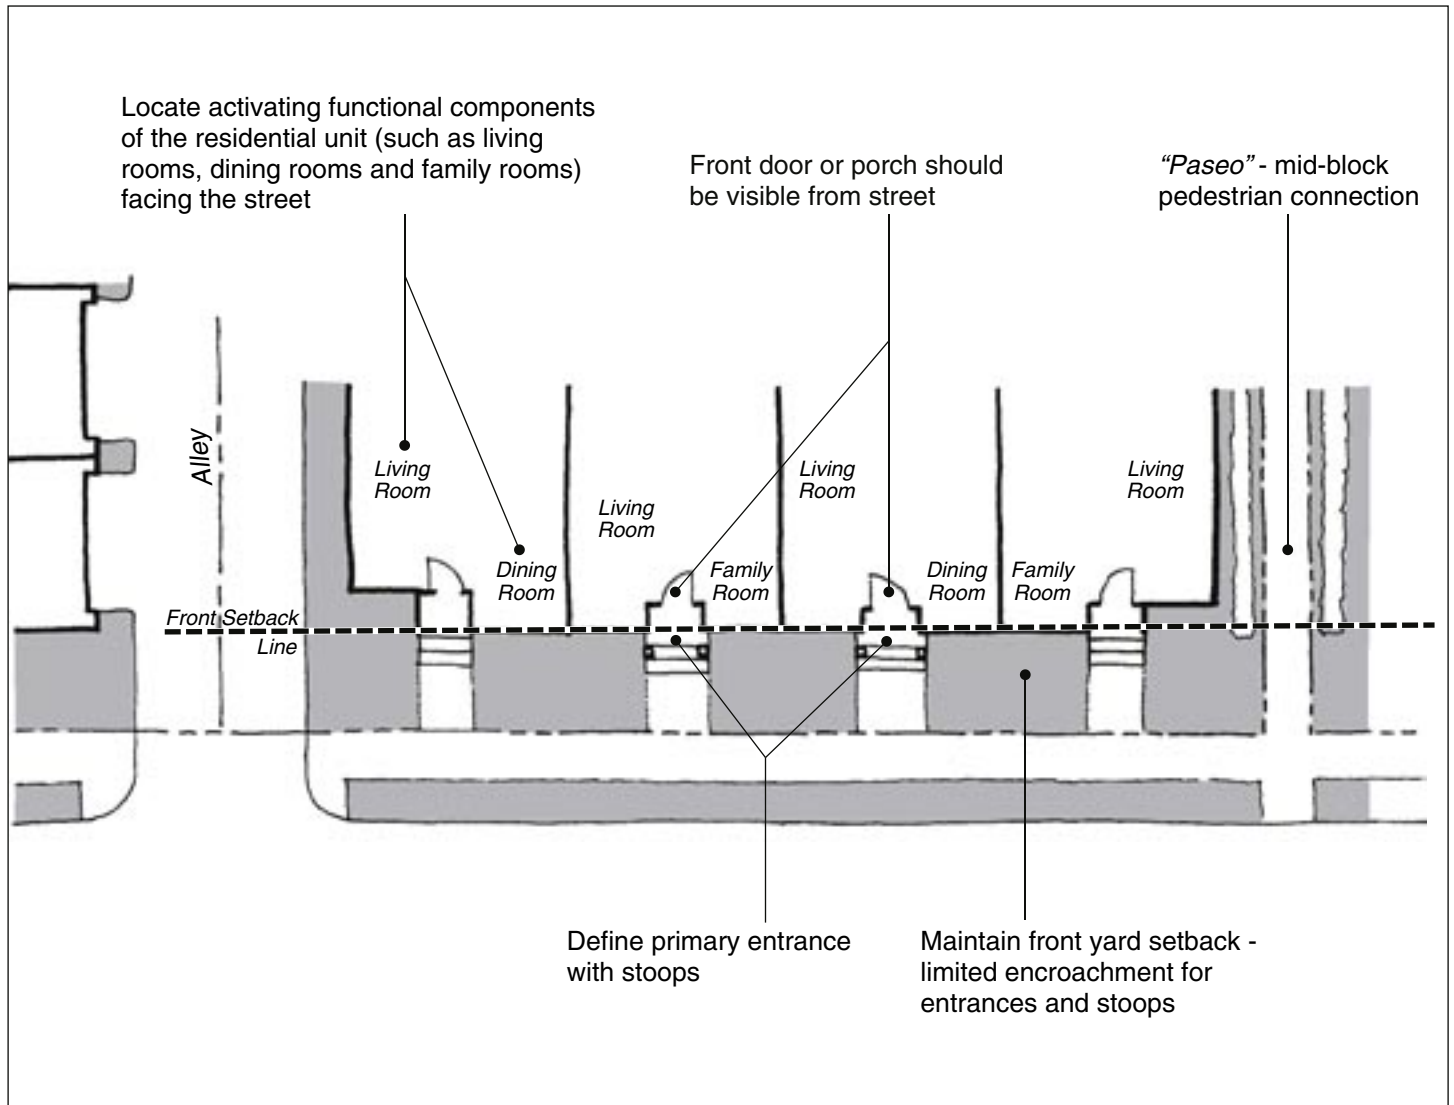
Row House District - Porches, Entrances and Frontage Conditions
